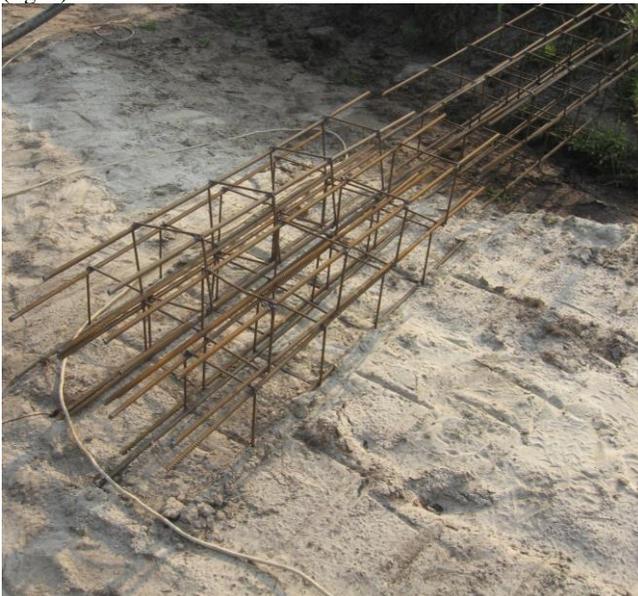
Reinforcing frame to be dipped into the reinforced soil-cement pile
